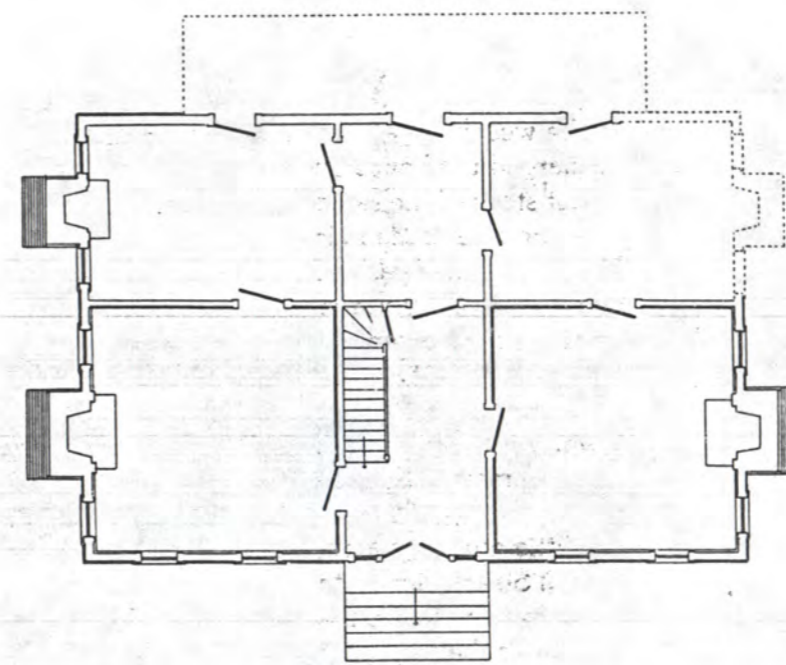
Restored First Floor Plan of the Phillip Schoppert House.
